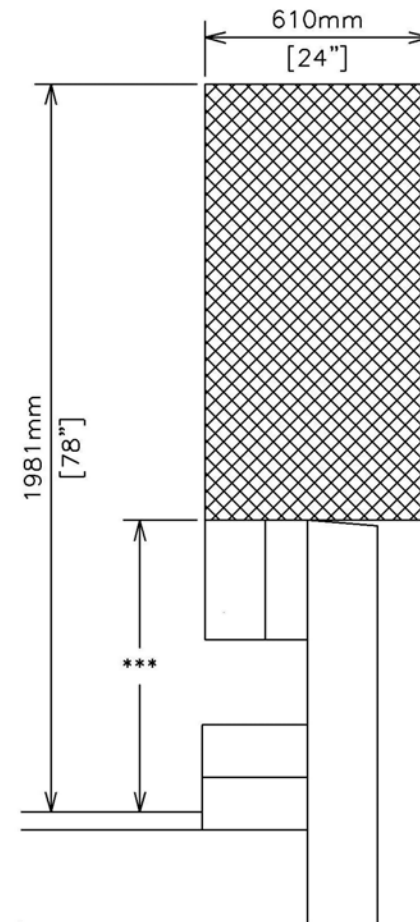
Intrusion Zones for TL-3 Concrete Barriers and Steel Tubular Rails on Curbs
